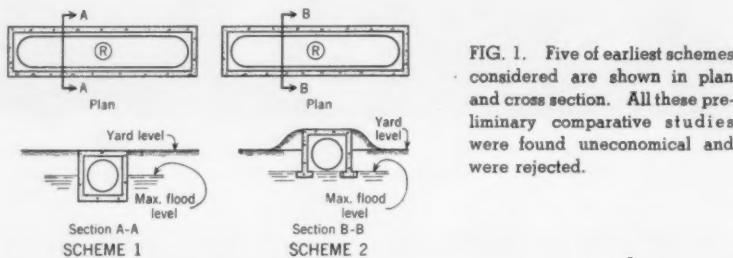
Five of earliest schemes considered are shown in plan and cross section. All these preliminary comparative studies were found uneconomical and were rejected.
